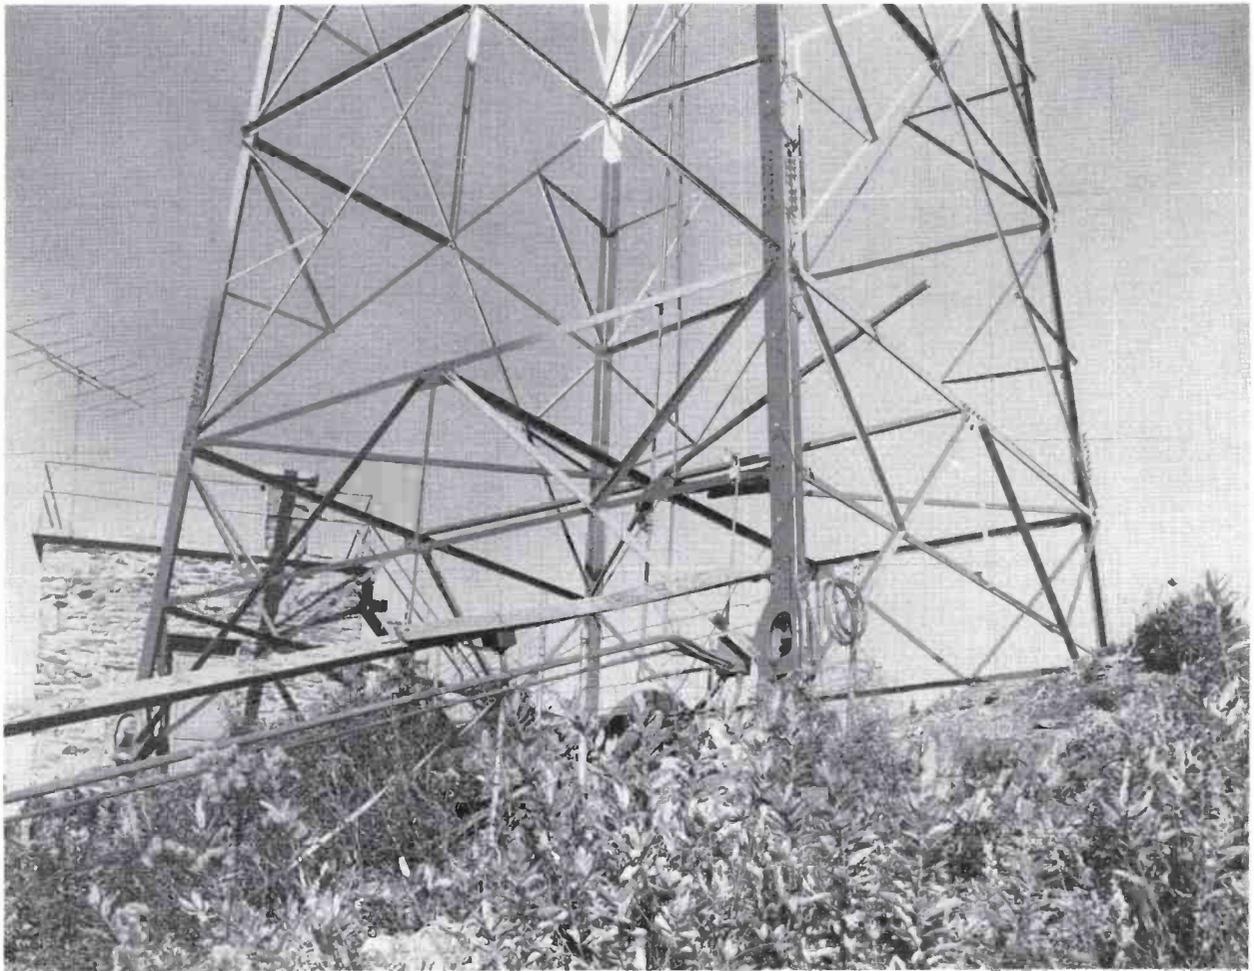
A 152-ft run of 3-inch coax transmission line and three runs of conduit enter junction box at base of tower . . . small stone building houses microwave equipment.
